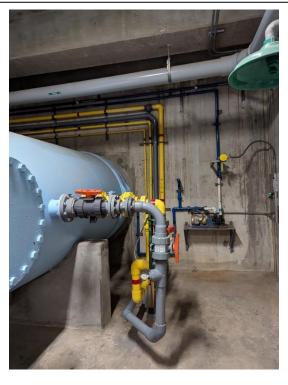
Line connection inside filters building ground level. (Refer to punch list item 5)
